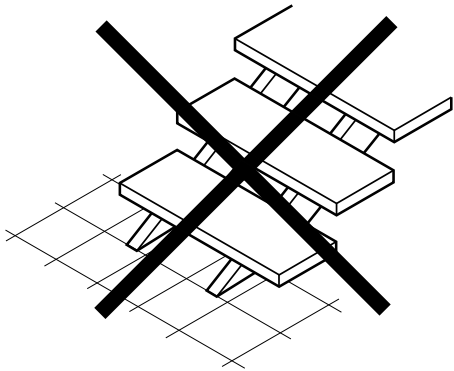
above from CSA B651 – Stair detail – Open risers (See Clause 5.4.1.)
